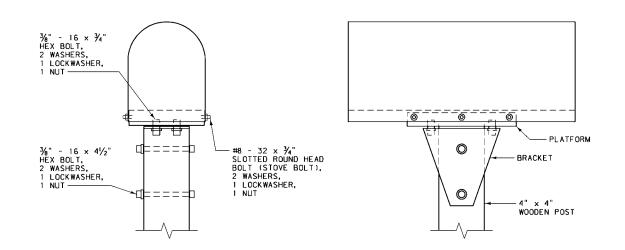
DETAILED DRAWING REFERENCE DWG. STANDARD SPEC. SECTION 900
